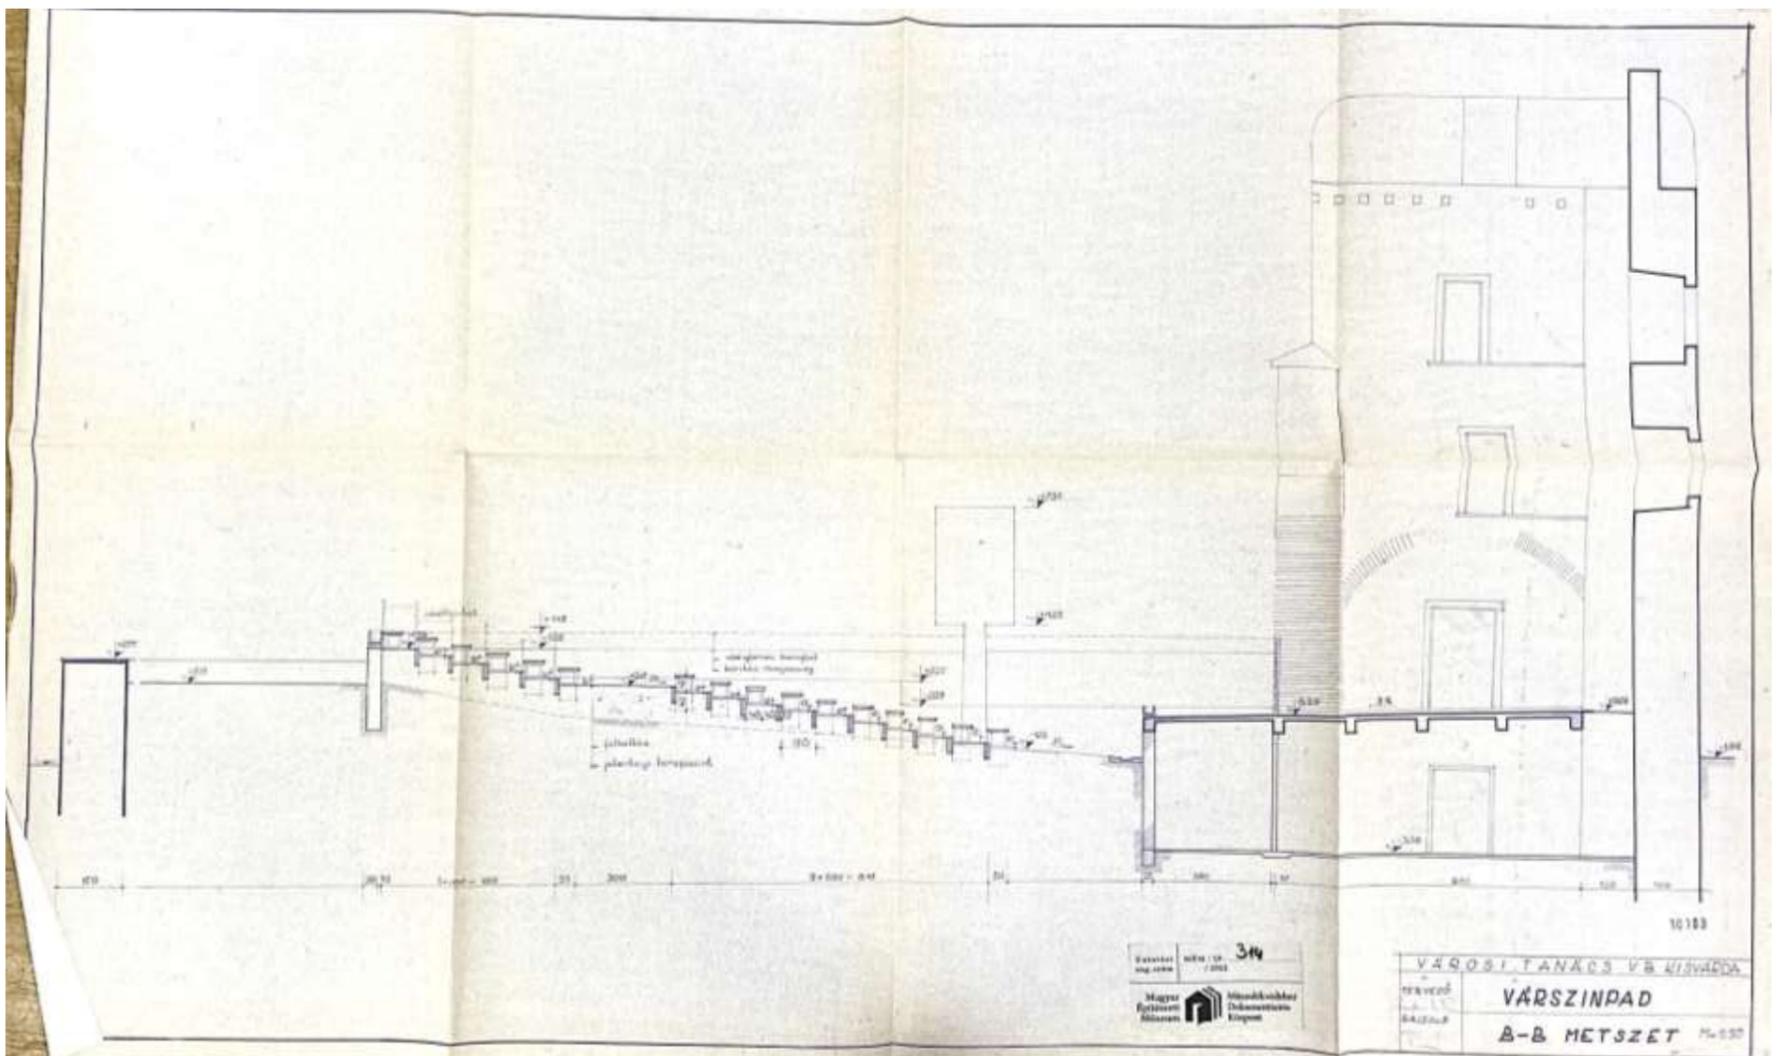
The cross-section of the plan made by Mrs. István Fodor, in 1972. (MÉM MDK Architecture Plan Collection, 10103)
